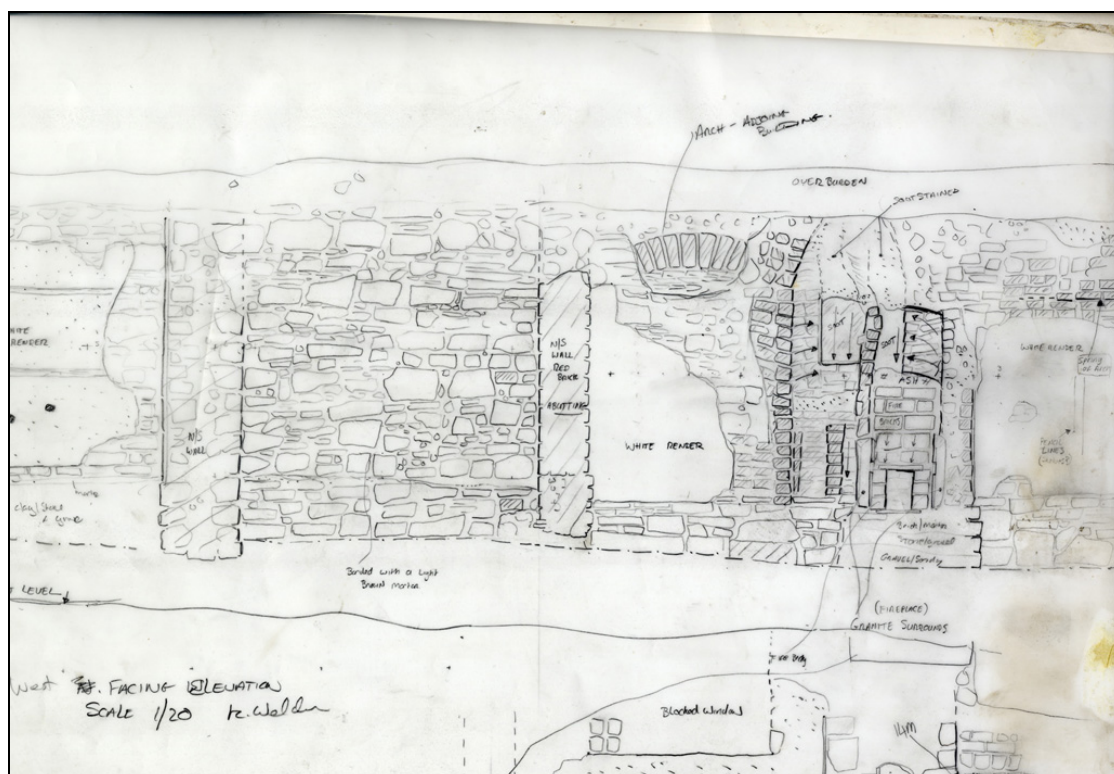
Site drawing from excavations at Smithfield. Post-medieval cellar wall. Franc Myles 2000. Margaret Gowen & Co. Ltd
